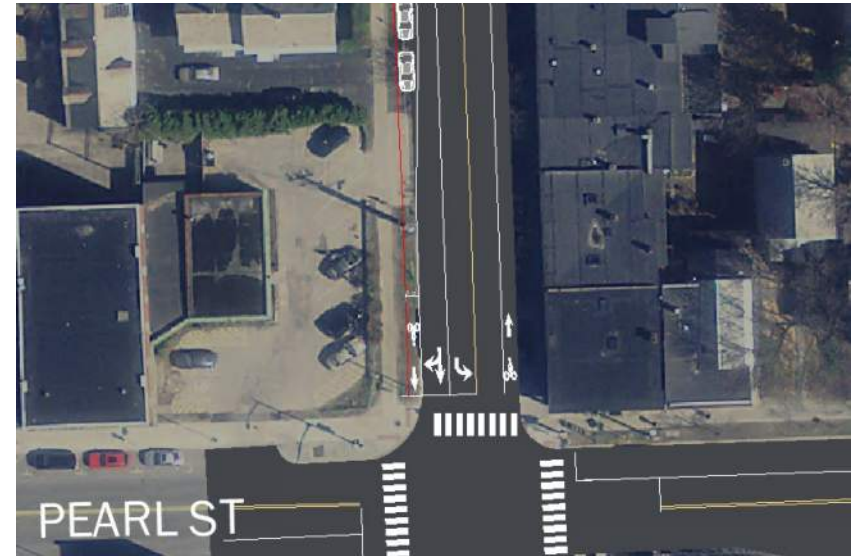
PEARL STREET INT. - SHORTER TERM
